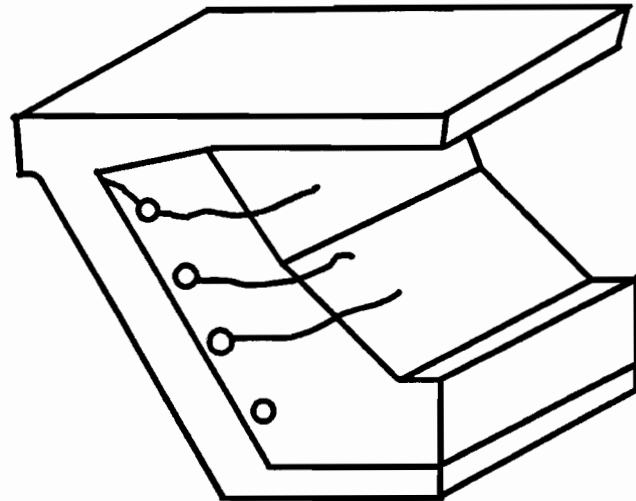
Cracking in Washington Metro pier segments.
